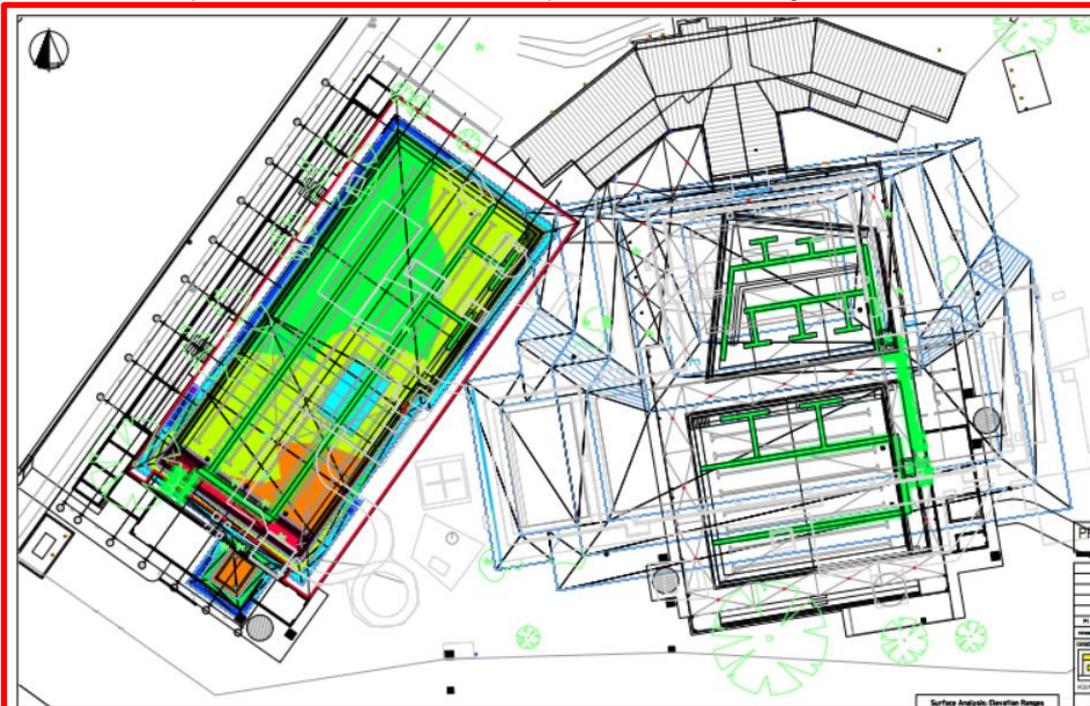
Earthworks (Proposed 50m outdoor) access via Turf Street.
